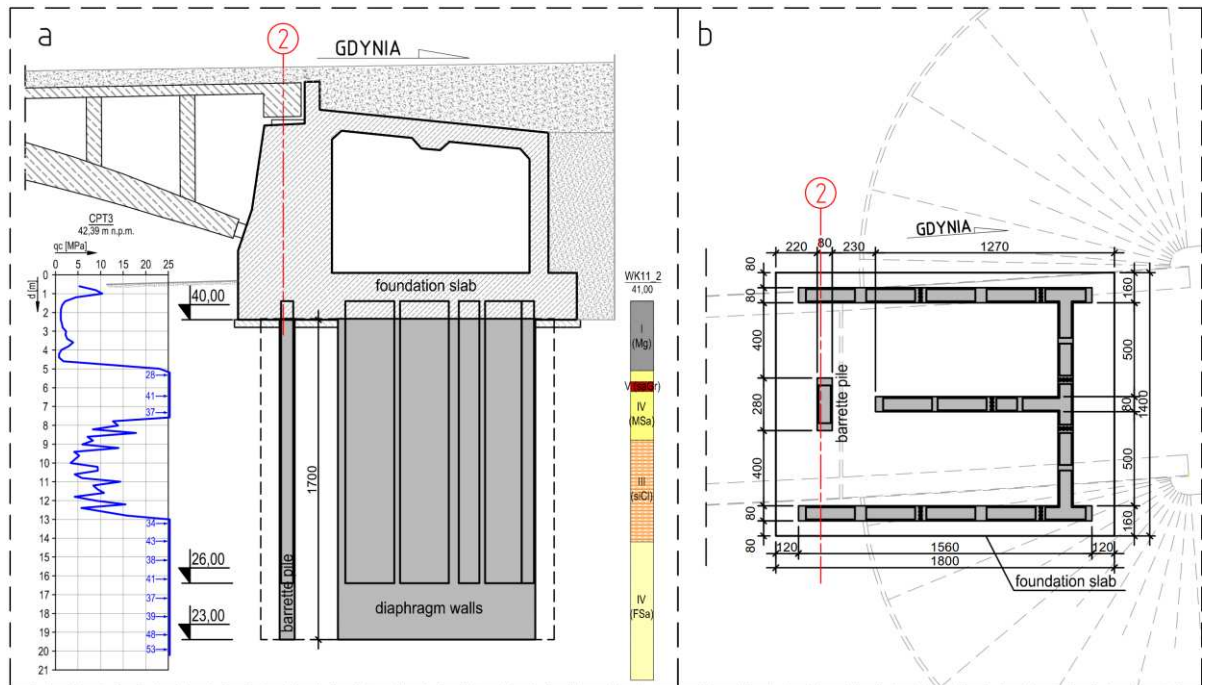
Deep foundations of abutment in axis 2: longitudinal section (a), D-wall layout (b)
